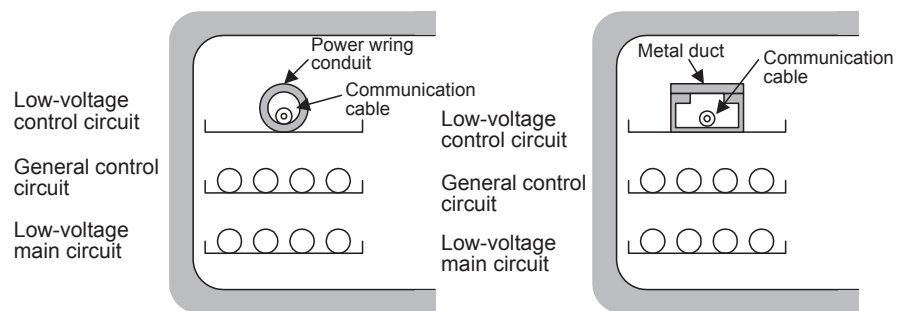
Wiring Using an Underground Pit or Underground Tunnel
